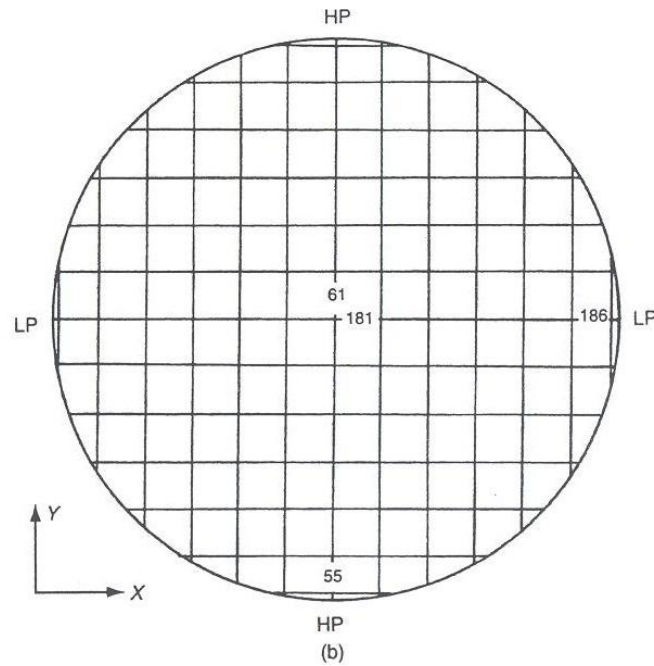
Plan view of the model used in the wind tunnel (LP: Low Points, HP: High Points) (from [8-23])
